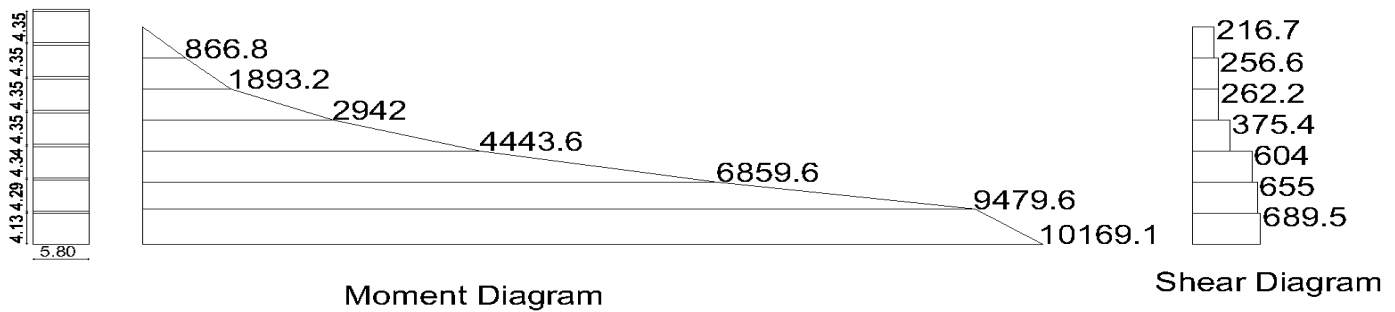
Shear and Moment Diagram of Shear Wall.
